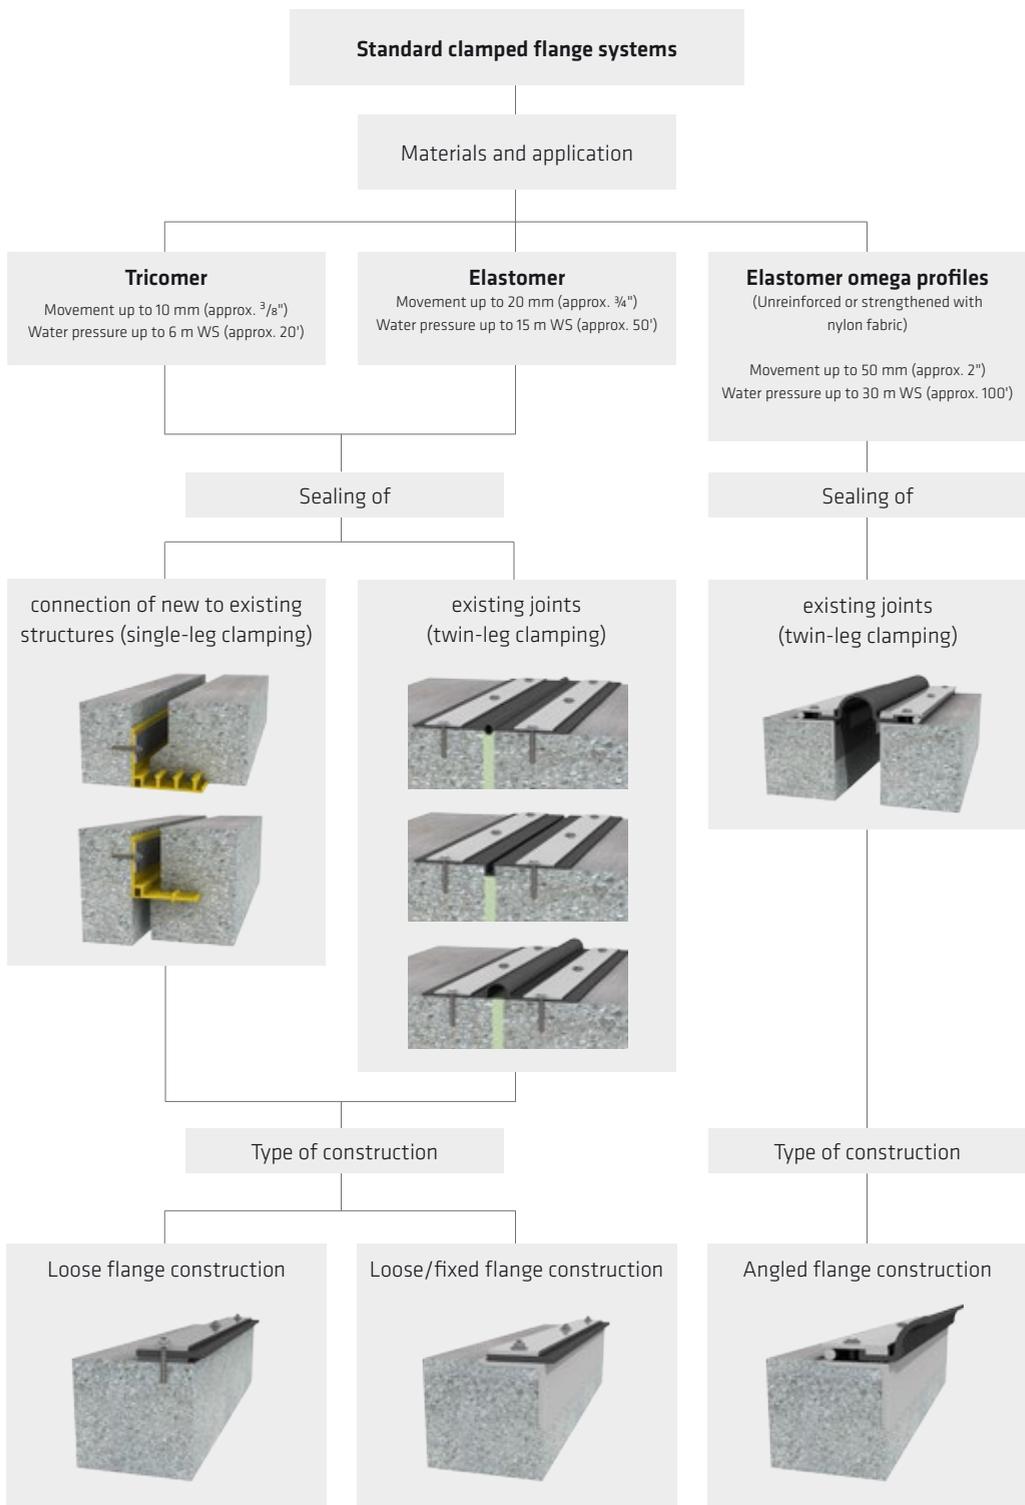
Different clamped flange expansion joint sealing system designs
